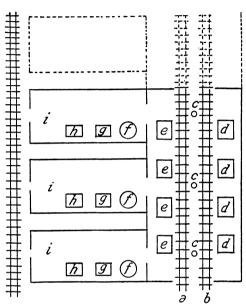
Plan of a mill designed by the Doney Slate Co., Pen Argyl, Pa.: a, b, Mill-car tracks; c, derricks; d, saws; e, planers; f, rubbing beds; g, h, carborundum machines, polishing machines; i, space for storage and crating.
